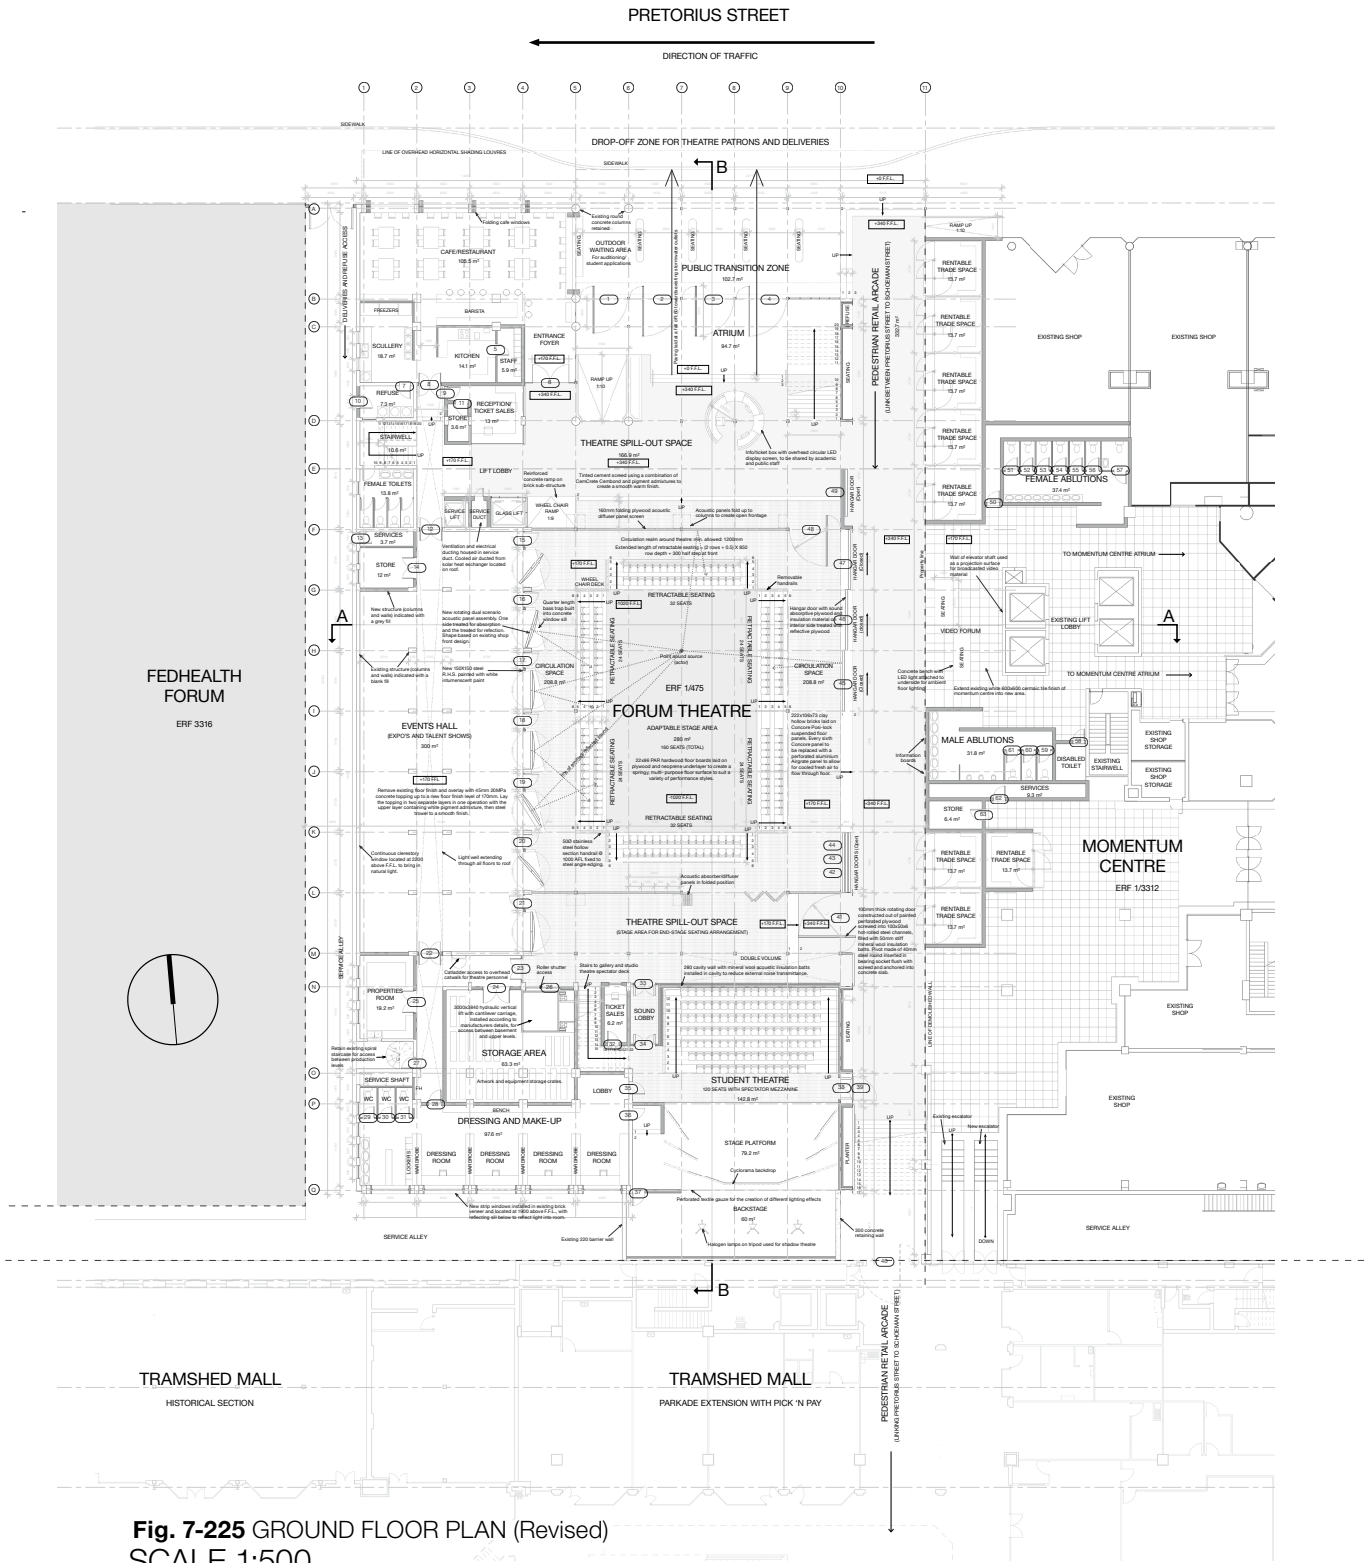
GROUND FLOOR PLAN (Revised)
